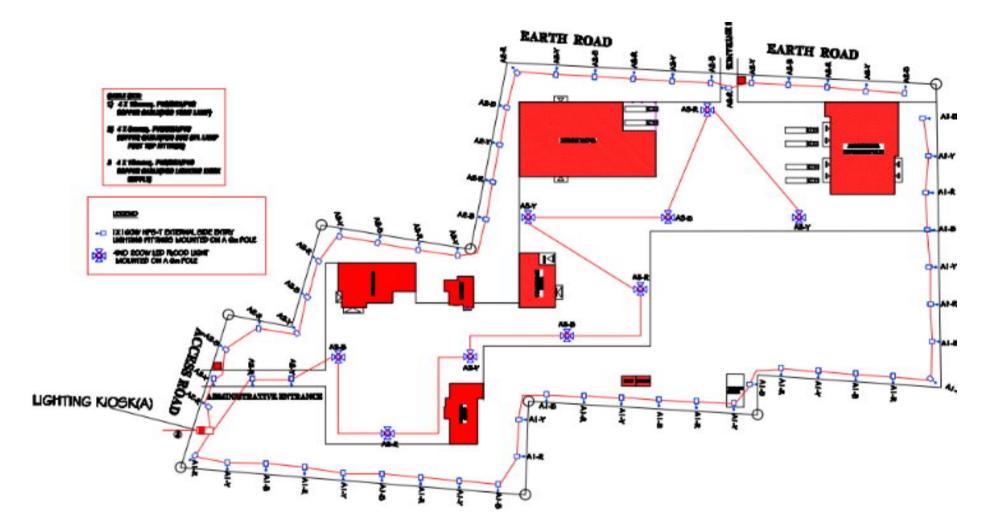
Site Plan of the proposed FMSDC in Auyo, Jigawa state
